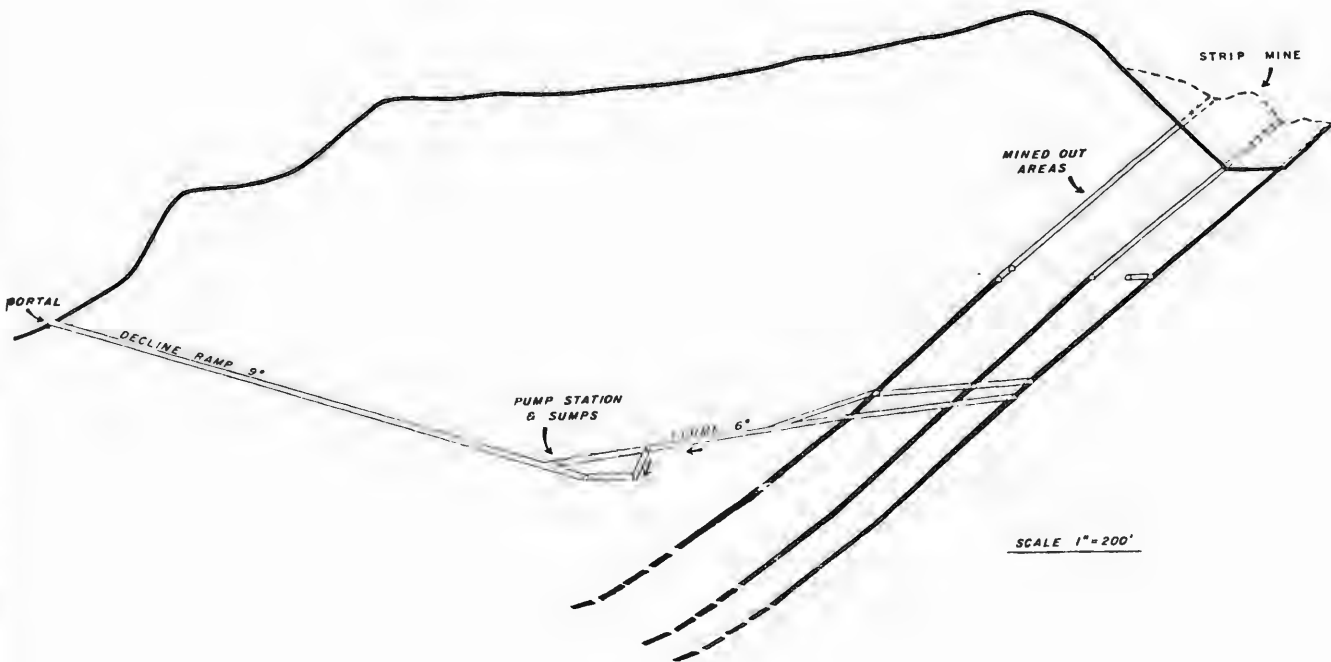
PROPOSED HYDRAULIC MINE LAYOUT
